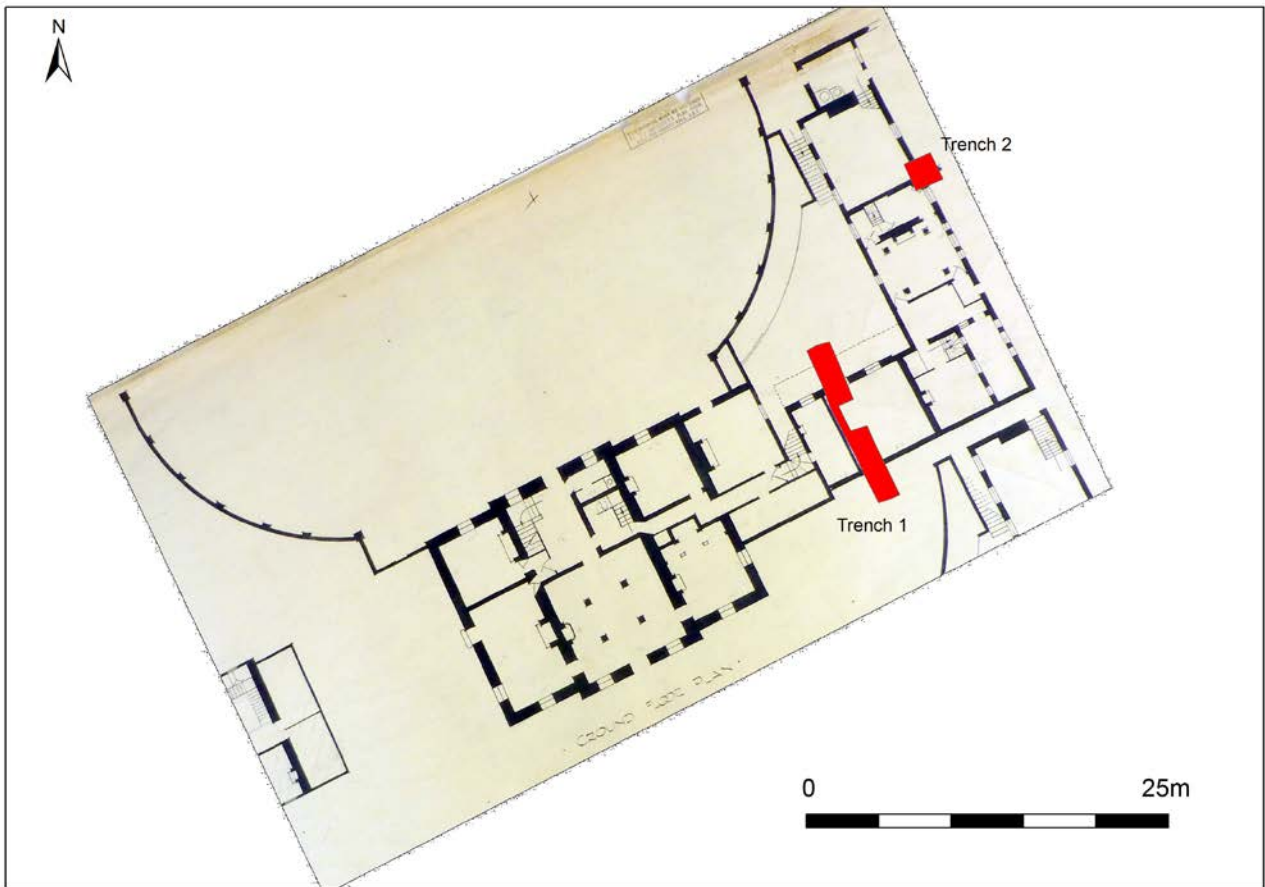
Architects plan from 1904 showing location of Marble Hill House and Service Wing,
